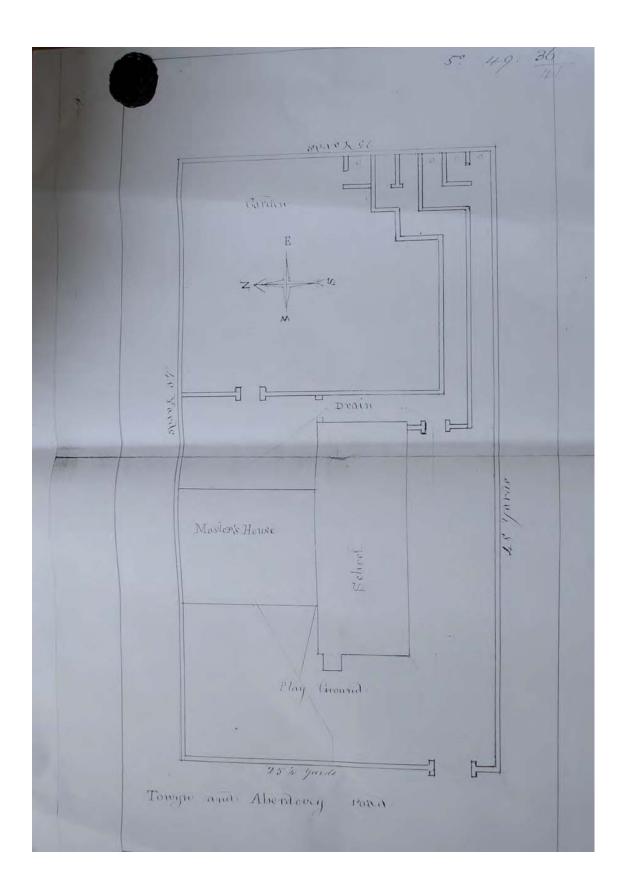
Ground Plan of original 1860 School Building (Merionydd Archives)
